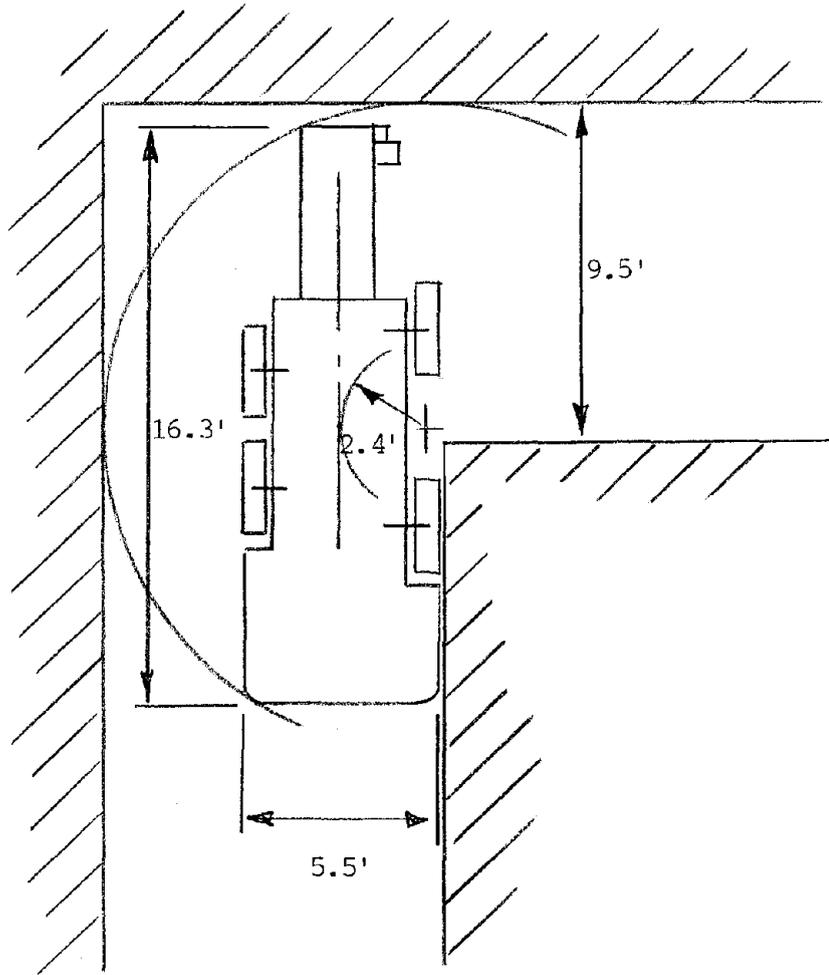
Minimum Entry Width for 90° Single Pass Turn Transfer Bolter Single Boom (New Chassis)
